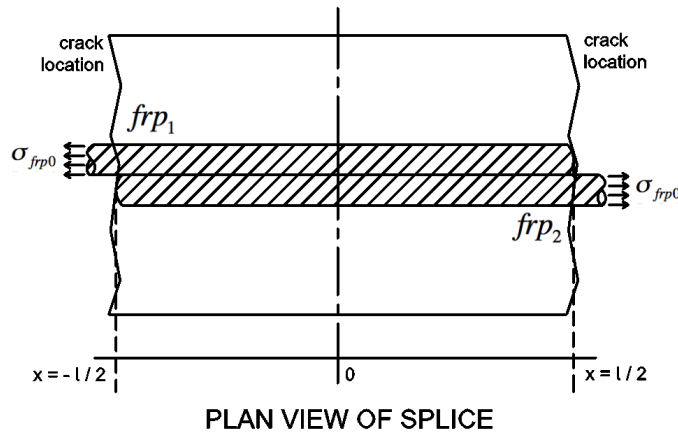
Plan view of a single splice confined between two cracked regions (Tepfers 1980)
